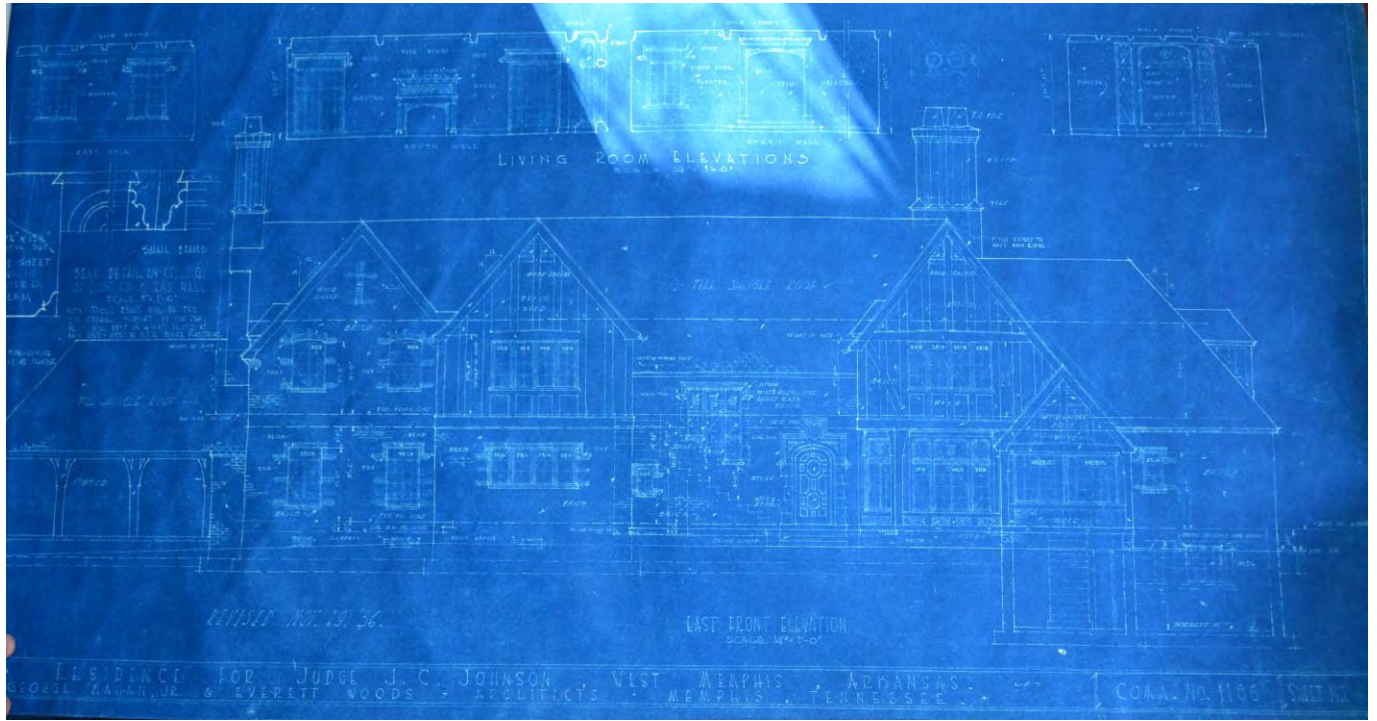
East Elevation Drawing, Johnson-Portis House, 1936.
